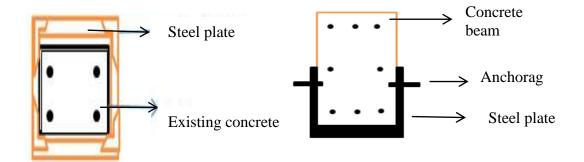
(a): Section of steel plated beam (b): Beam with steel plate at tension side
